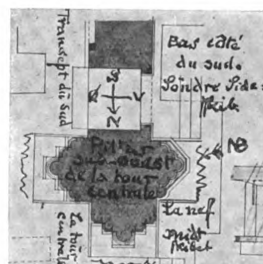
Cathedral of Nidaros. Plan of part with south-west pillar of tower.
